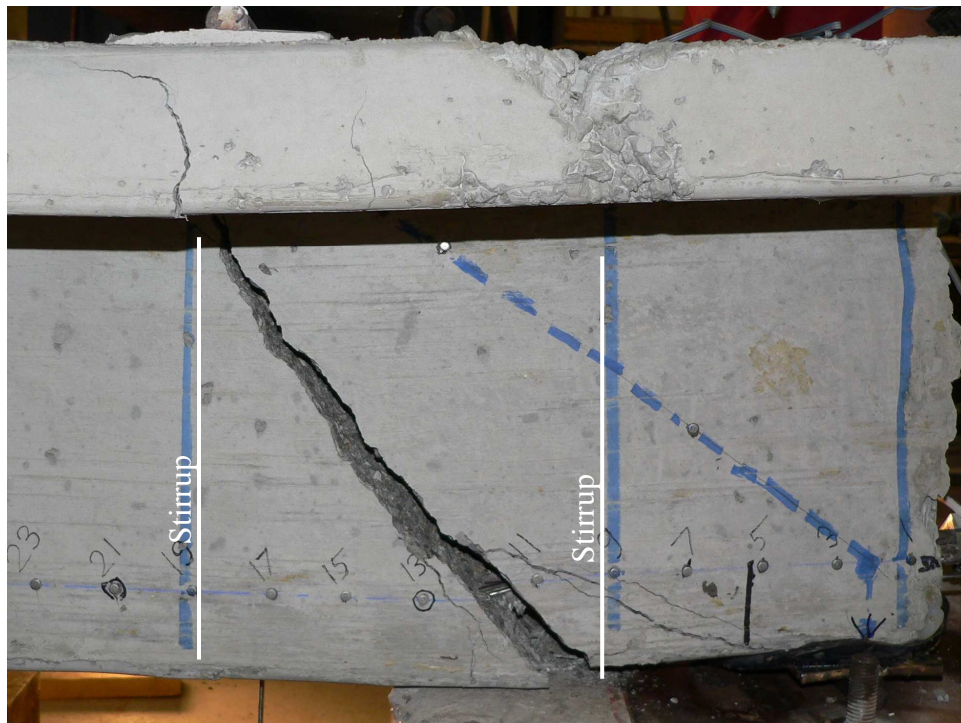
Diagonal crack location of specimen SCC-HS-E
